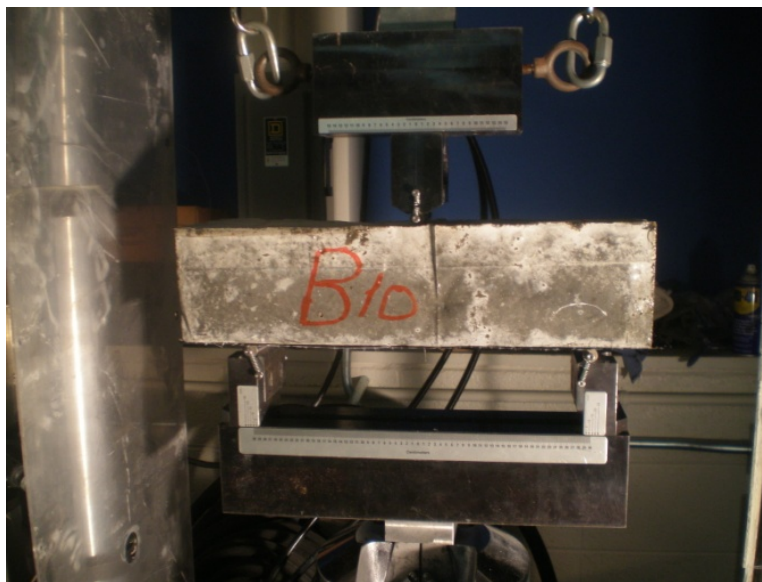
Beam specimens B10 strengthened by Fyfe CFRP and Sika epoxy
